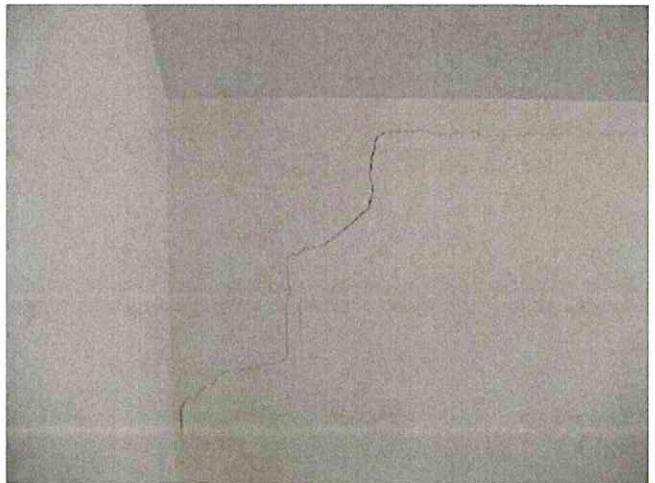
Showing an example of a crack in the interior drywall.
